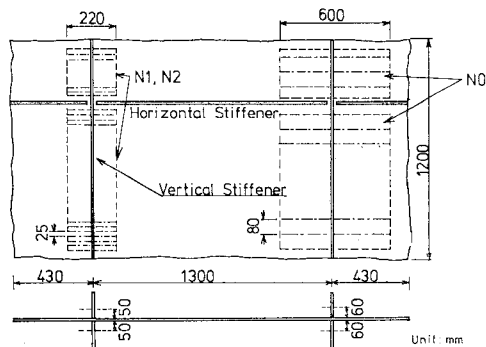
Schematic view of a part of a plate girder where fatigue test specimens are cut out.
